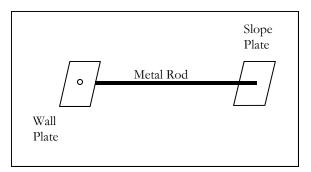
A. Cross Plate Anchor. A double plate anchoring system connected by a metal rod. Rod is driven through undisturbed soils to connect plates.
